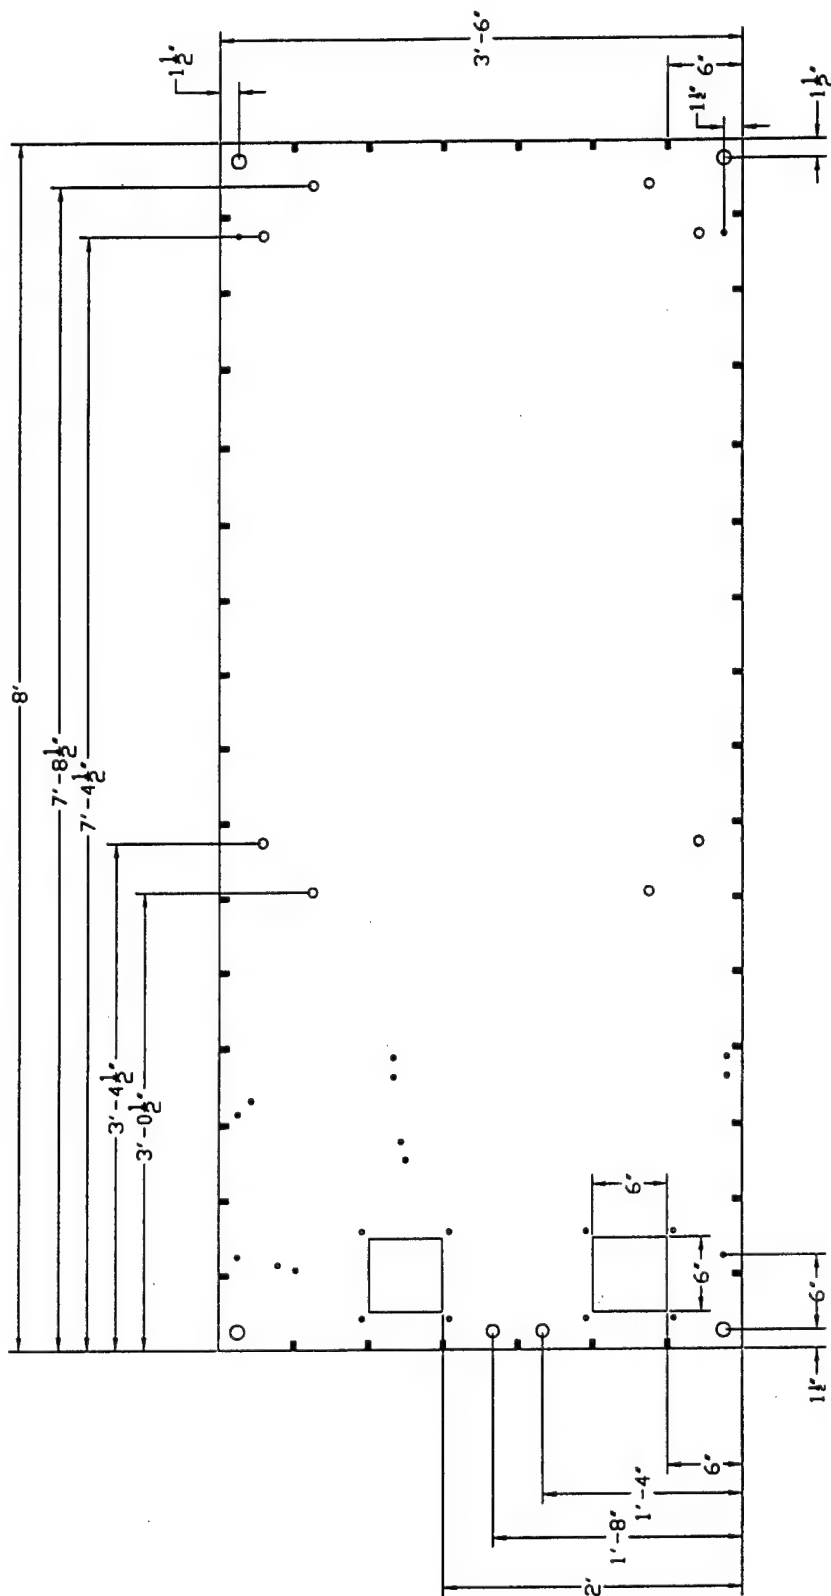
MODULE INTERIOR PLAN VIEW
